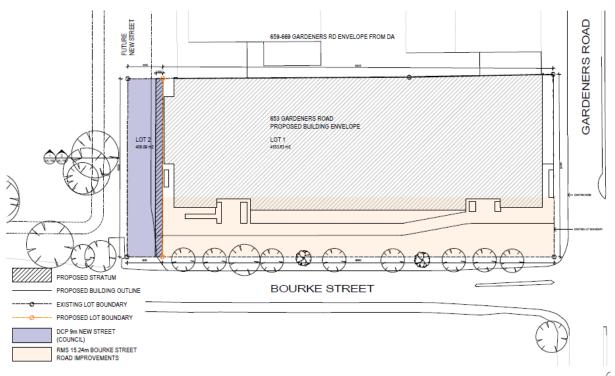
Plan submitted with the application showing the proposed subdivision and road widening areas. The application nominates the road widening area as being for Bourke Street road improvements
